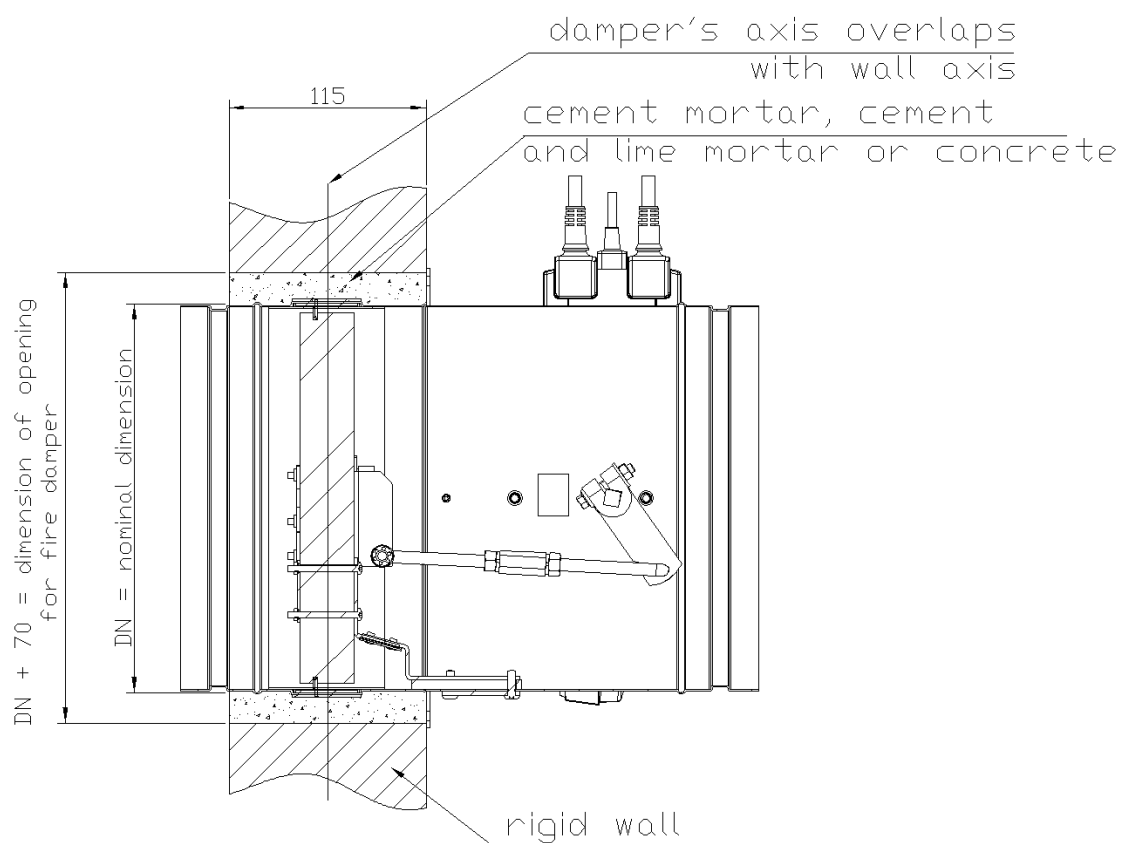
Installation of KTS-O in rigid wall construction with 115 [mm] wall thickness.
